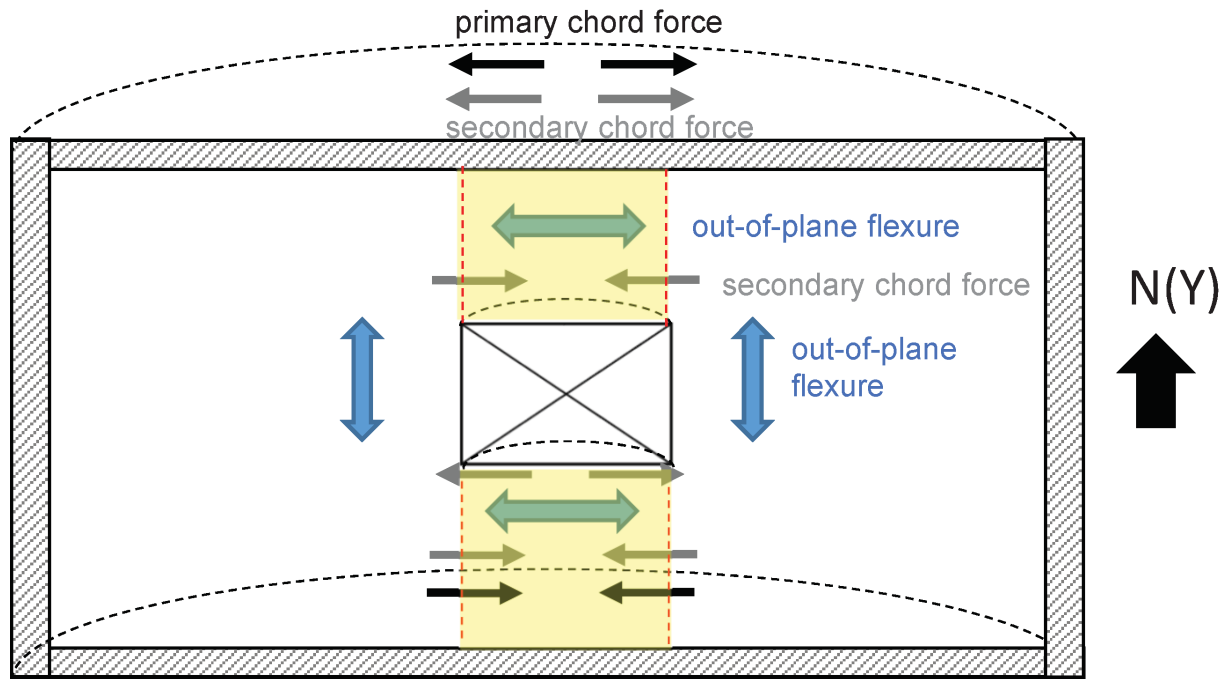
Section cut locations to determine out-of-plane moment and shear around openings
